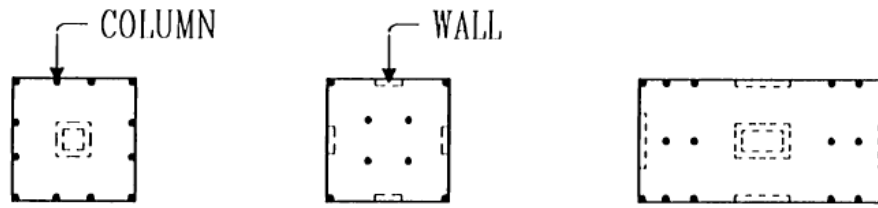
Favourable arrangement of restraining shear walls.
